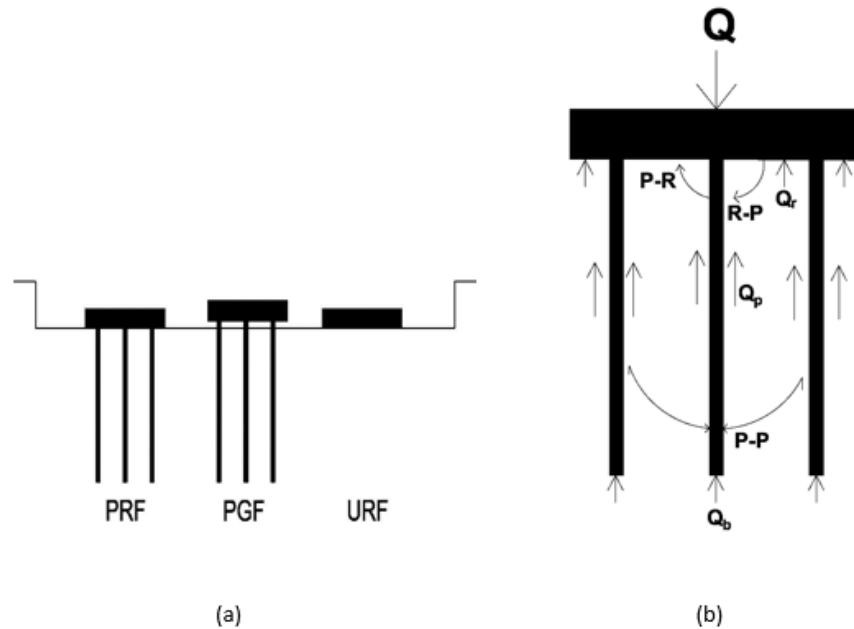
(a) Piled Raft Foundation, Pile Group Foundation, Unpiled Raft Foundation
